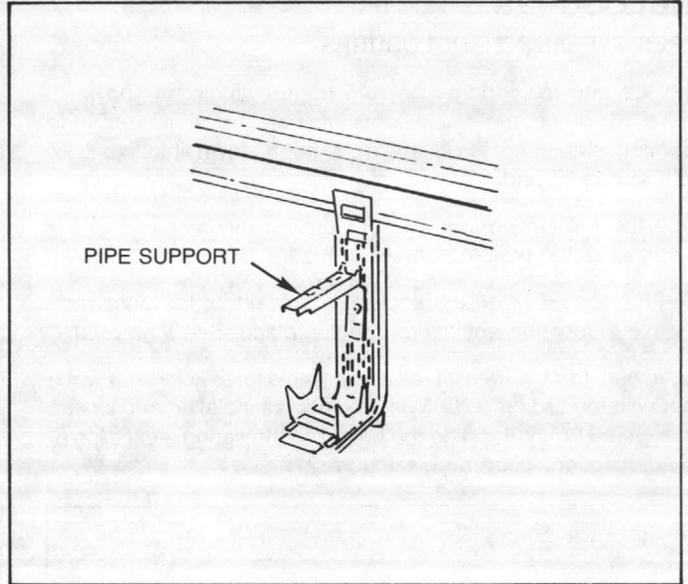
Enclosure Bracket with Pipe Support Installed
